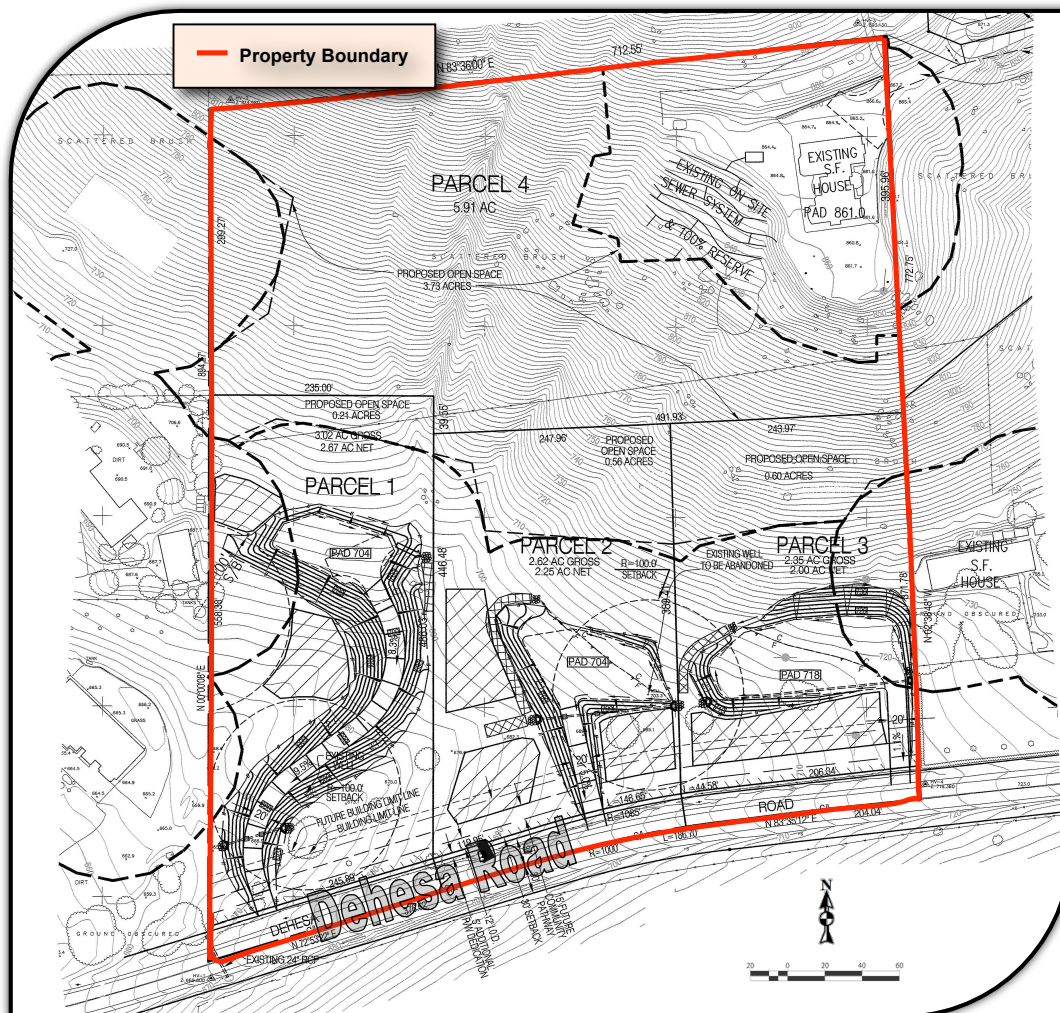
Proposed Site Plan – Shorees Property TPM 21054R (Site Design, Inc 7/08)
